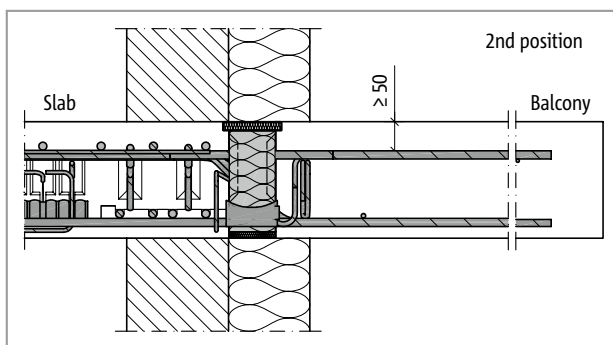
Schöck Isokorb® T type C: Section 2nd position; connection with thermal insulation composite system (TICS)
